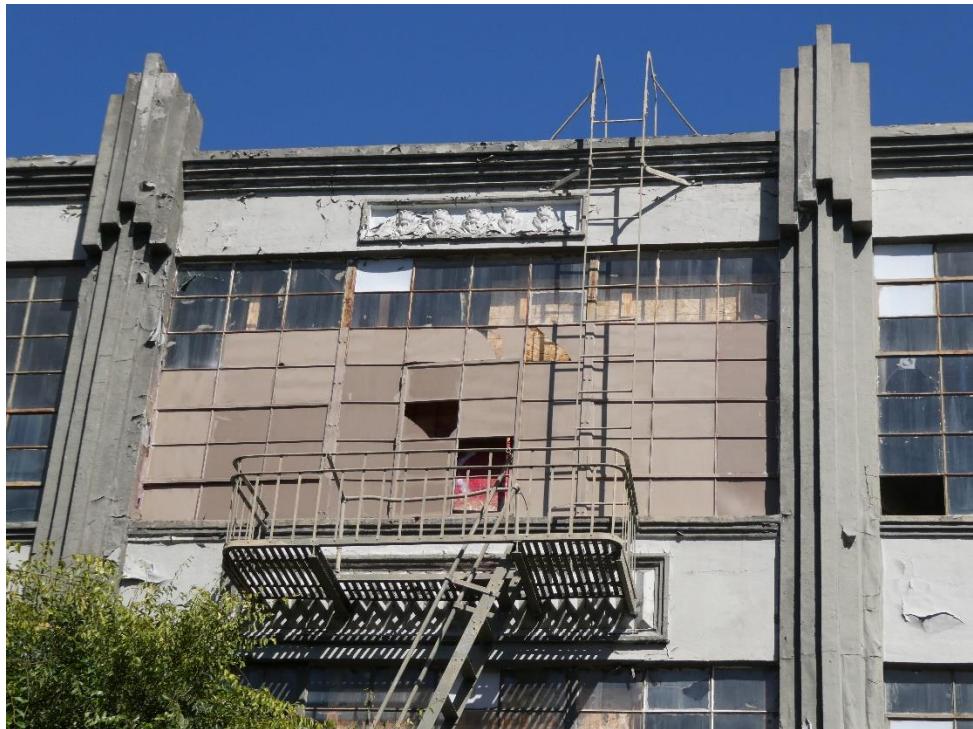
Additional broken and cracked panes at west façade. (Page & Turnbull, 2024)
